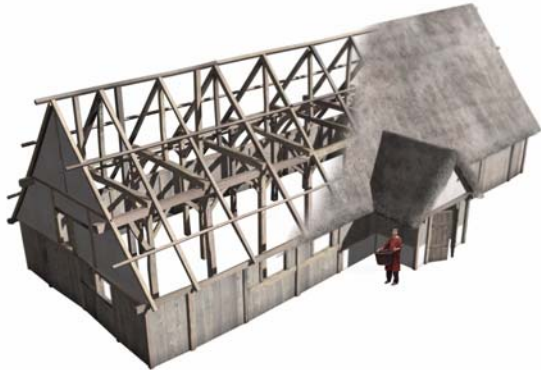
Still from animated reconstruction of the aisled building at Shiptonthorpe. This grows from a plan of the excavation. (Graphics: Mark Faulkner). [View animation:](#)
